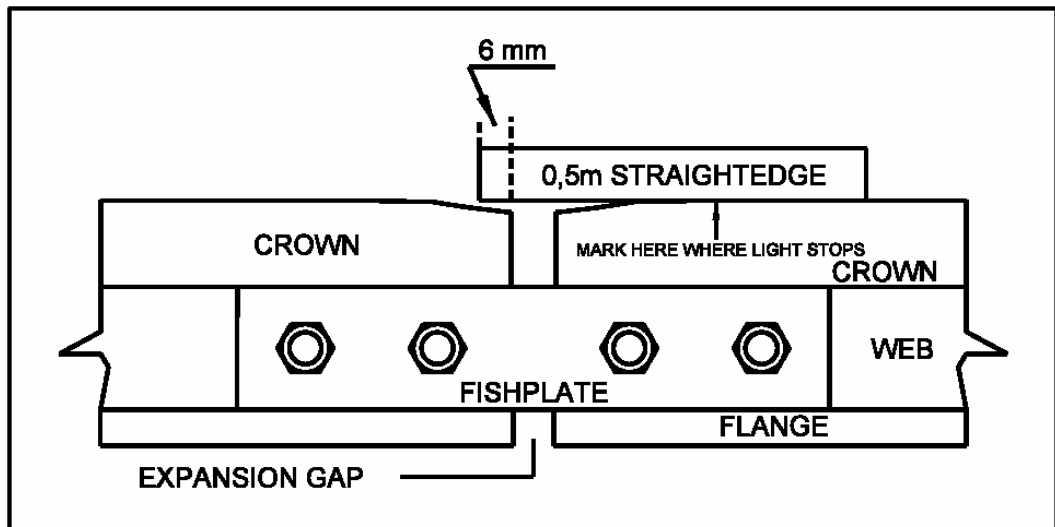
Measuring welding area on battered rail ends.
